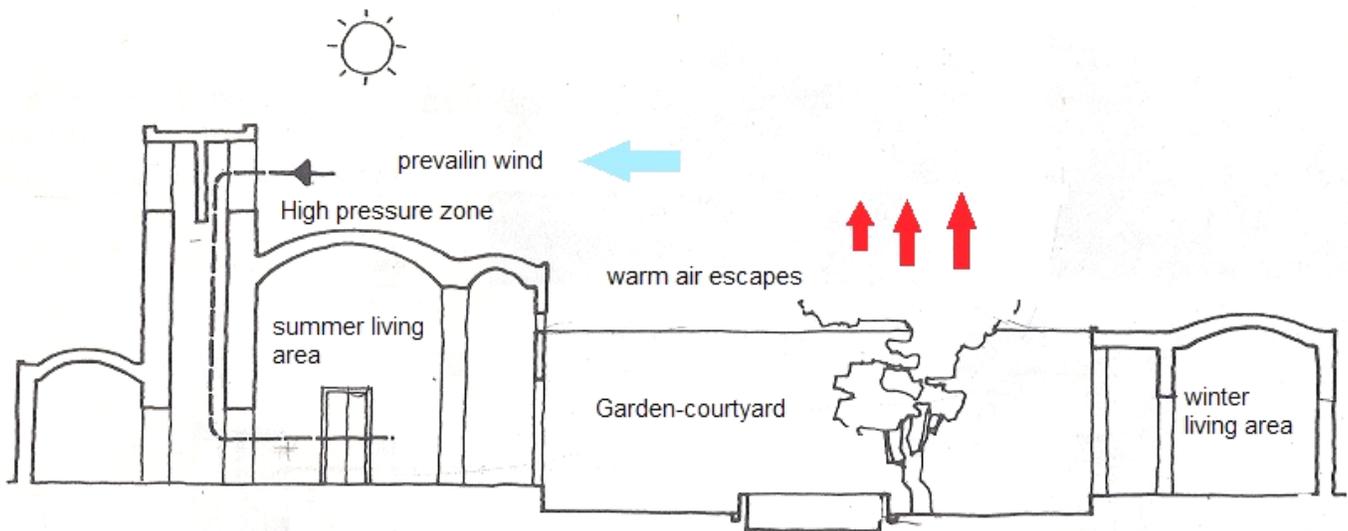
A Cross Section of a House in Zavareh, Iran [48]
